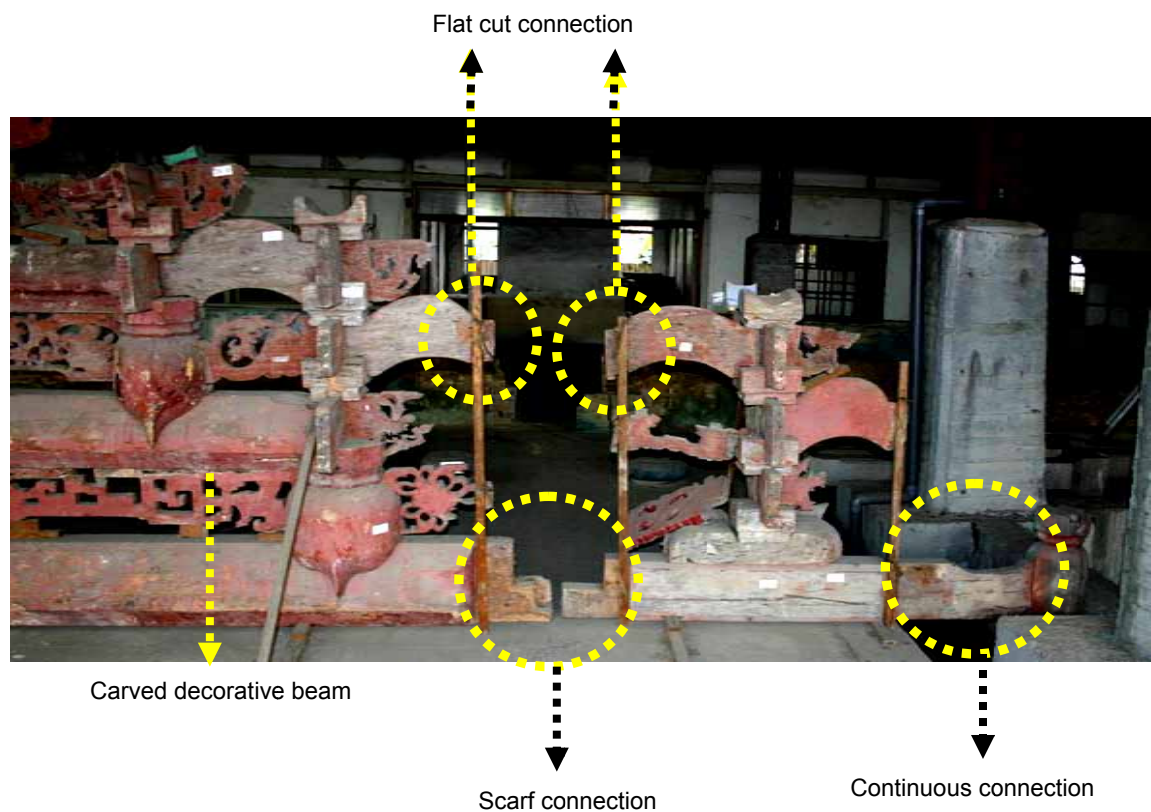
The three different types of beam to column joints in Dieh-Dou frame
